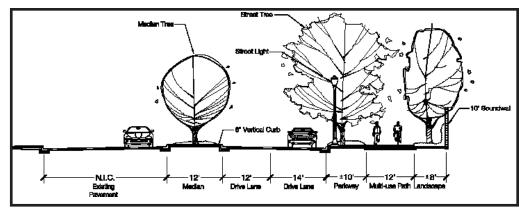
Arterial Road - Lathrop Multi-use Trail Frontage, Section B Union Road- South of the Community Entries
